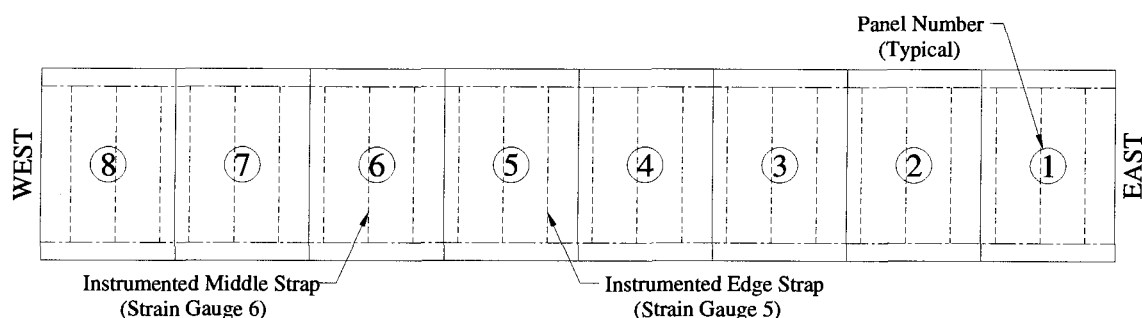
Plan of Panel Layout Showing Locations of Instrumented Steel Straps
